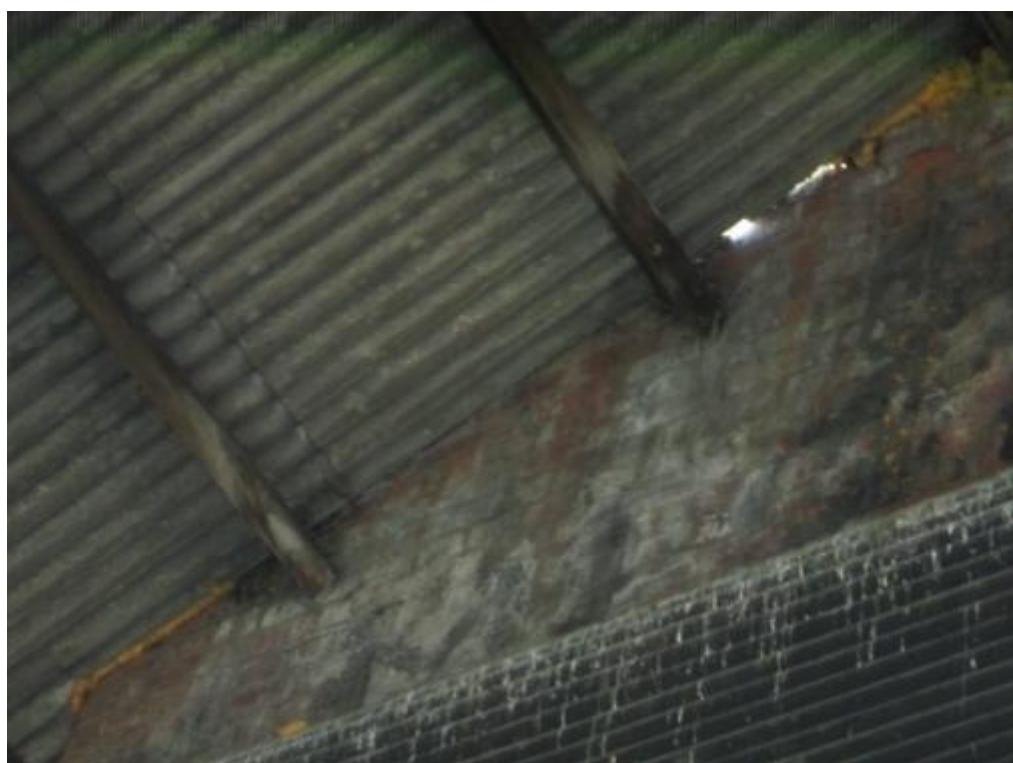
Purlin bearing into wall above Piccadilly entrance
